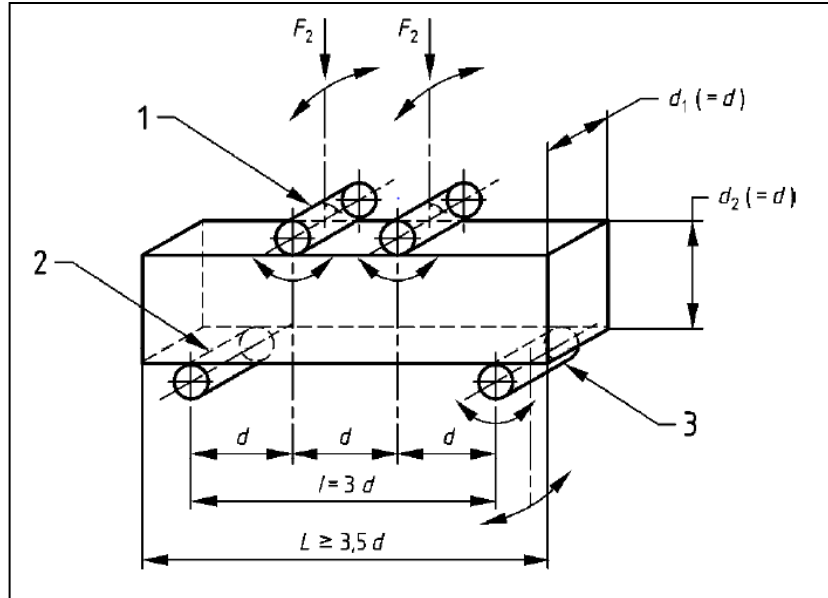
Arrangement of loading of test specimen (third-point loading) (BS EN 12390-5:2009)
